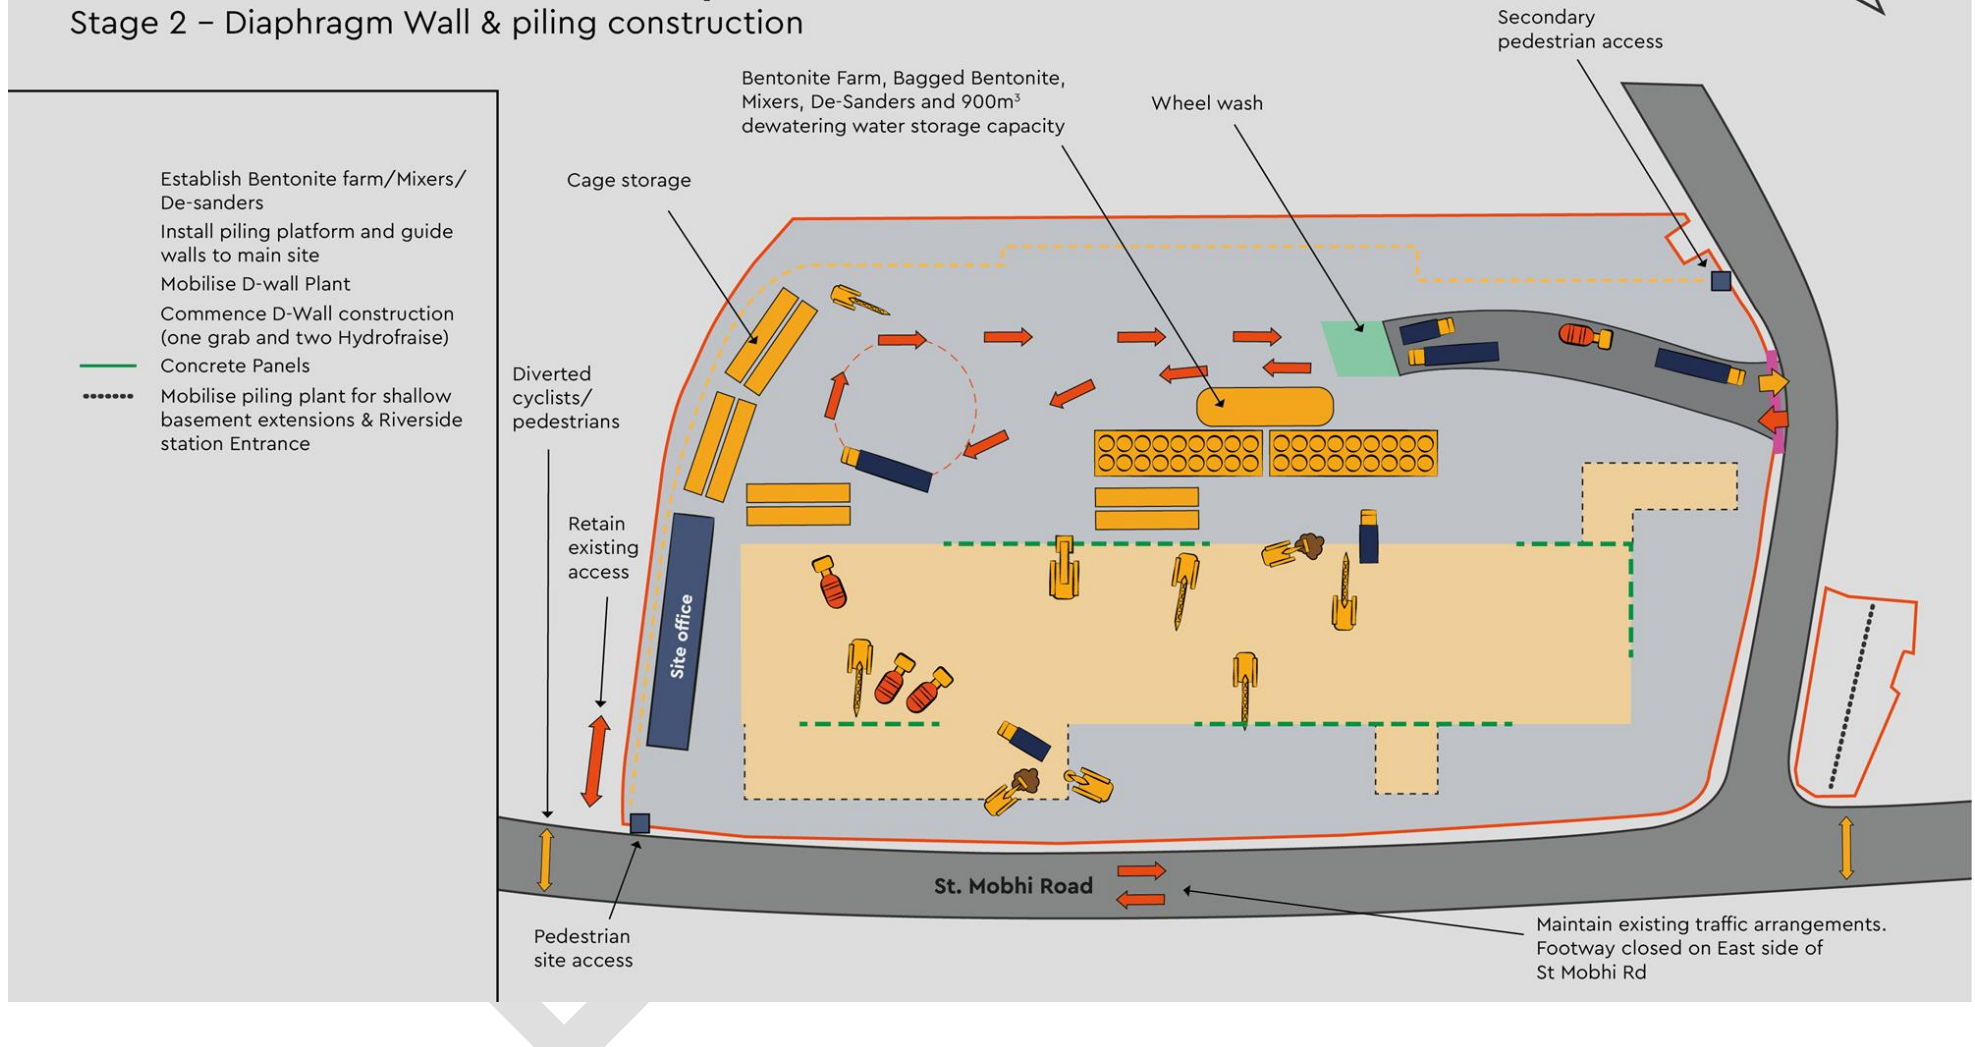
Griffith Park Station - Stage 2 - Diaphragm Wall and Piling Construction
